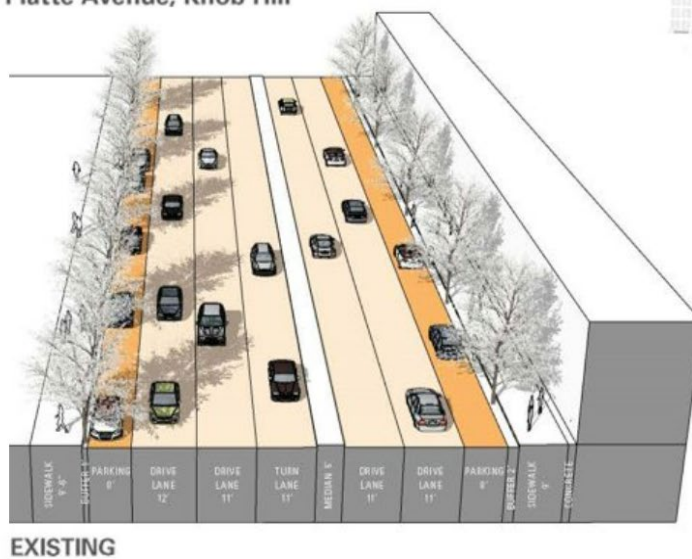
Platte Avenue Knob Hill character area showing an existing section of Platte Avenue.
